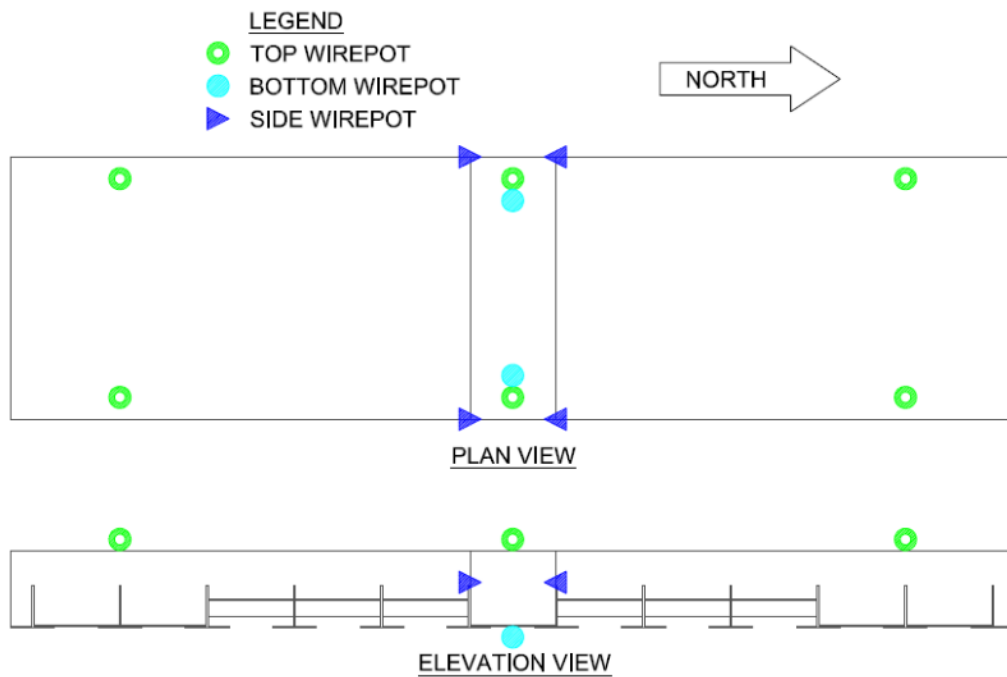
External Instrumentation Locations – Shear Reversal Test
